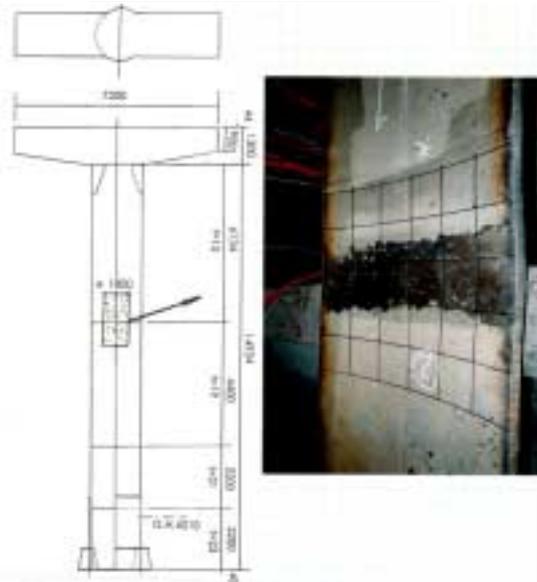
The Steel Plate Cut from the Damaged Pier
